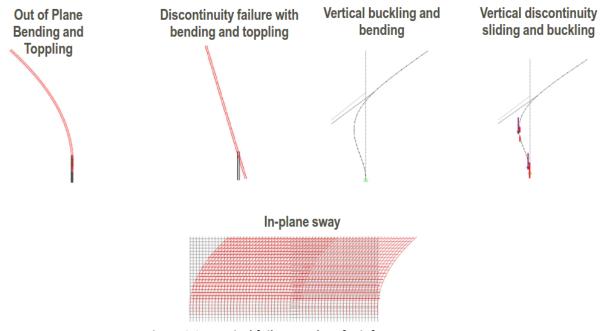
Typical failure modes of reinforcement cage
